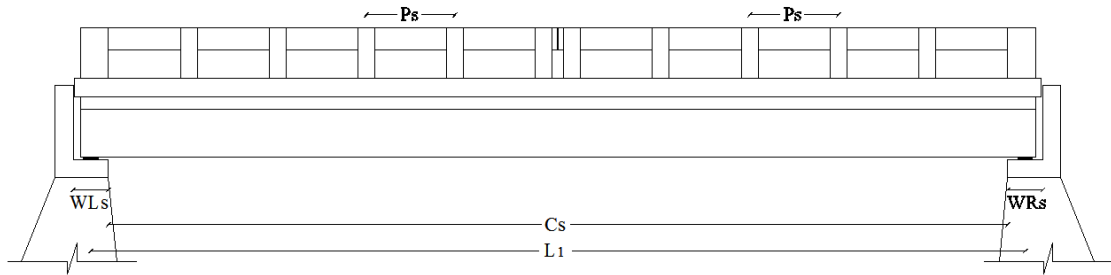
Longitudinal Section of a T-/ Box- Girder Bridge
